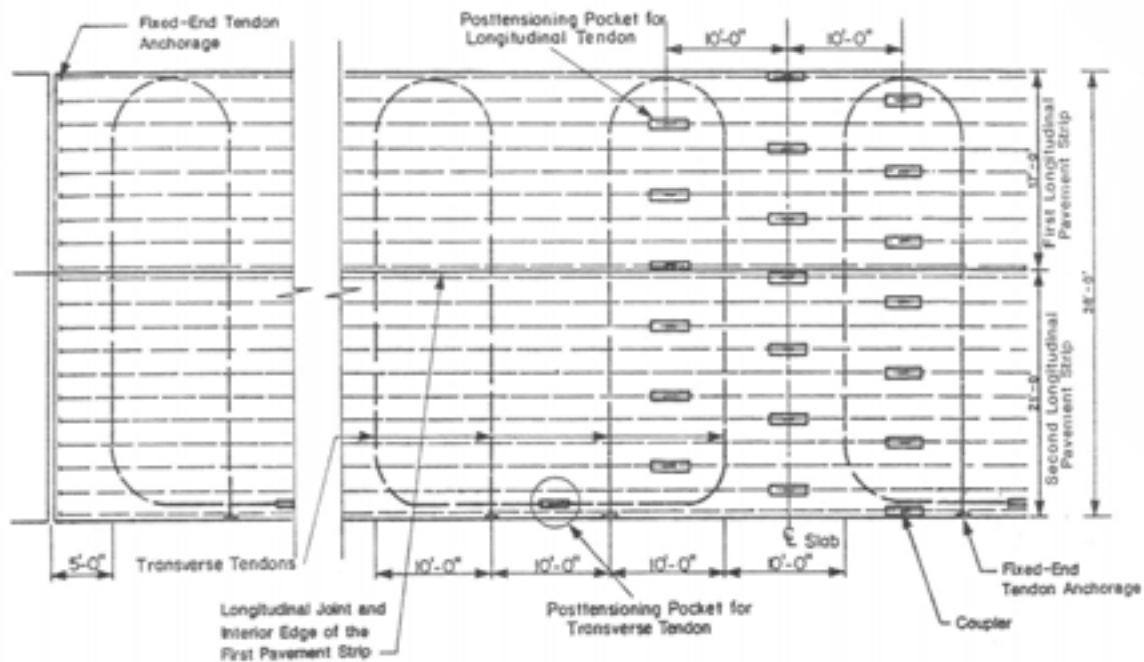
Plan view of transverse tendons used for PCP in Texas
